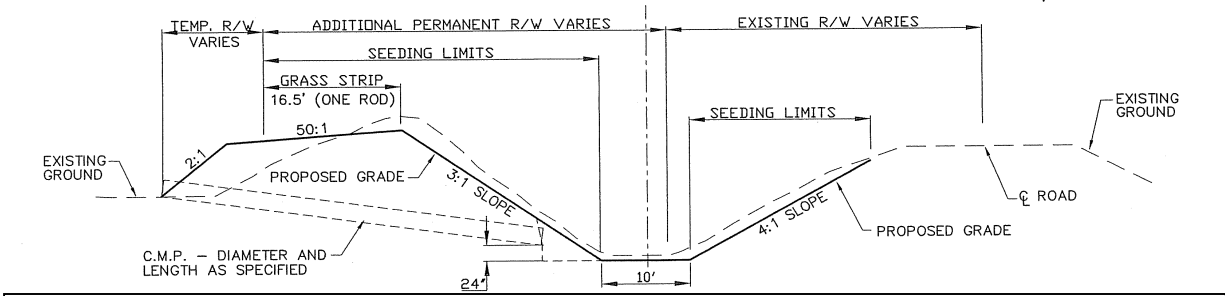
Typical Current Drainage Ditch Designs for Side Inlet Conduit and Along Roads (not to scale)
